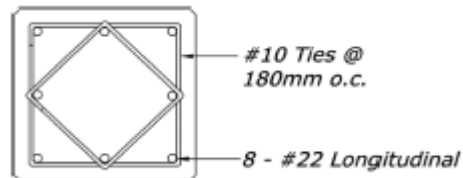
Fick et al., 2017 [3] column reinforcement.
